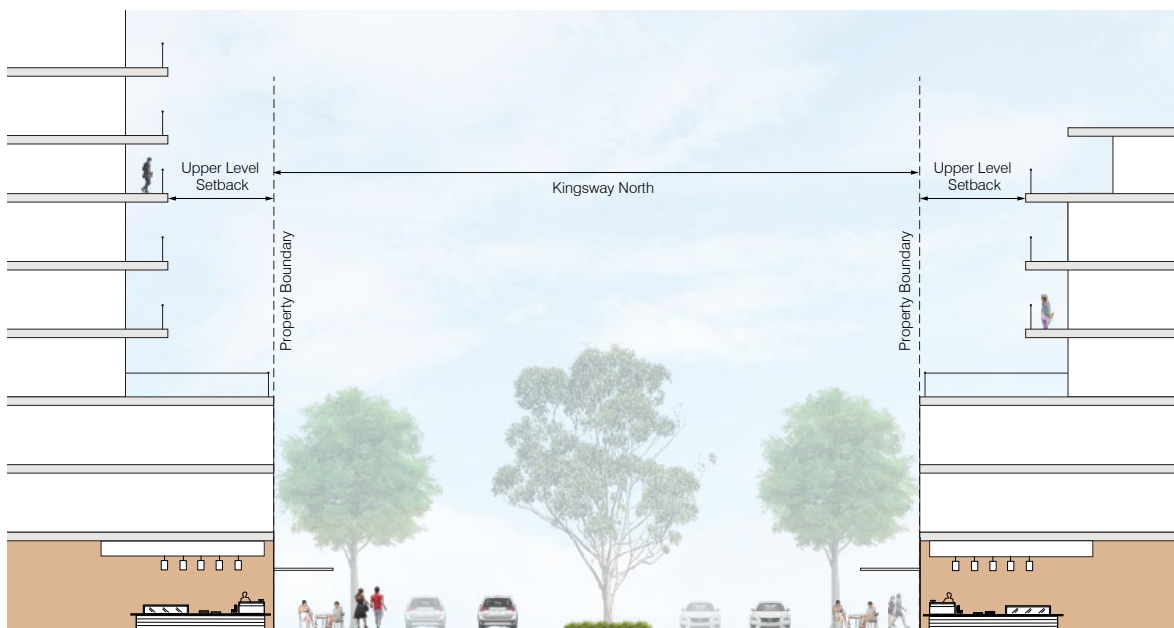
Section C - Illustration of potential typical section of Kingsway north of Railway Parade North
